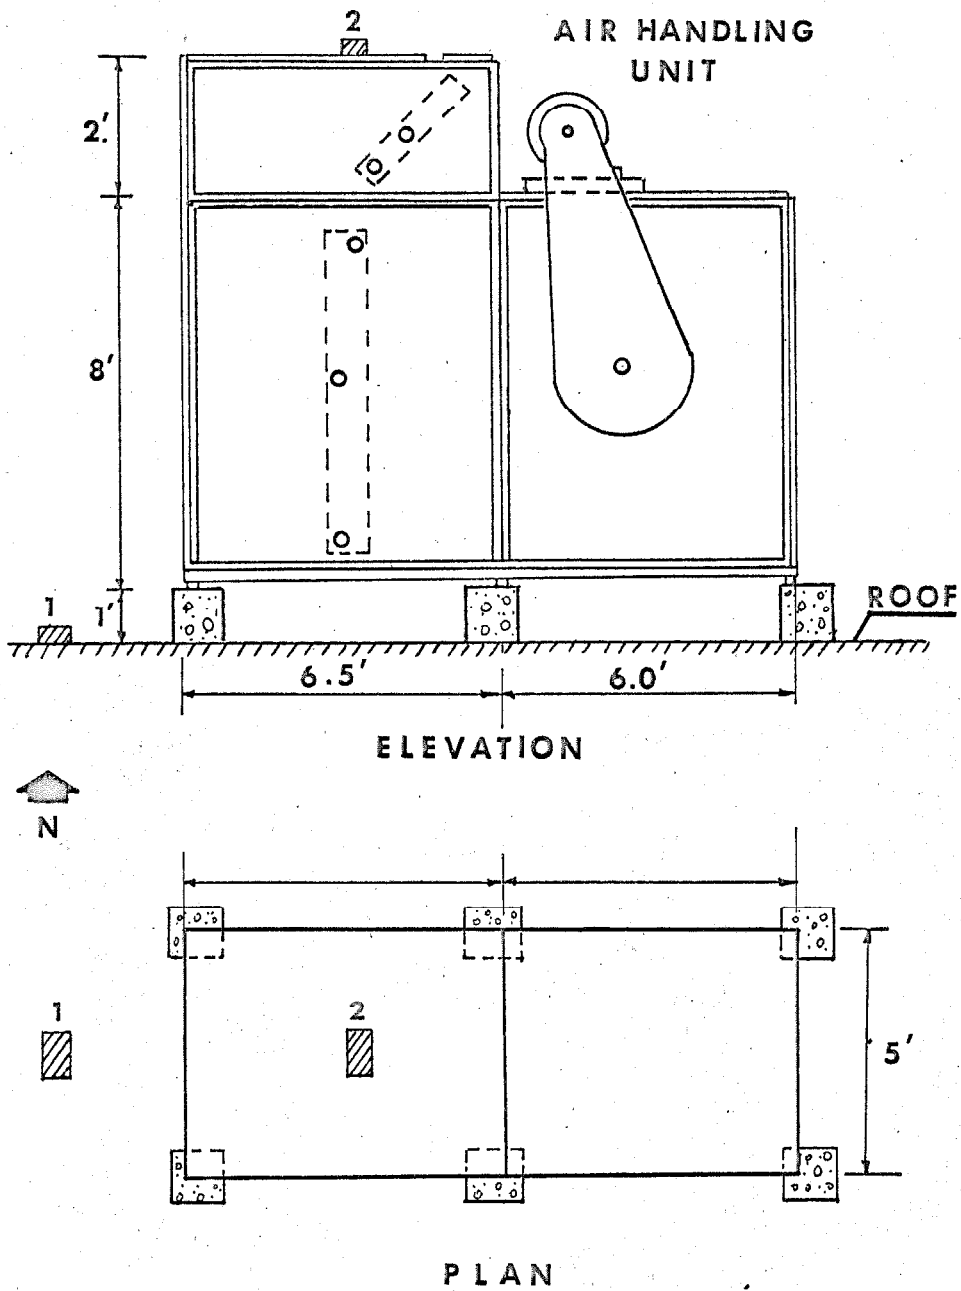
1 PLAN AND ELEVATION VIEWS OF THE AIR HANDLING UNIT, SHOWING LOCATIONS OF THE ACCELEROMETERS
